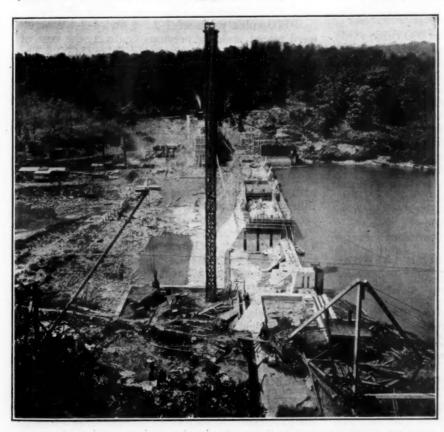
LOOKING TOWARD WEST END THREE WEEKS AFTER DATE OF FIG. 1. SHOWS VERTICAL BONDING GROOVES AT EXPANSION JOINT.
